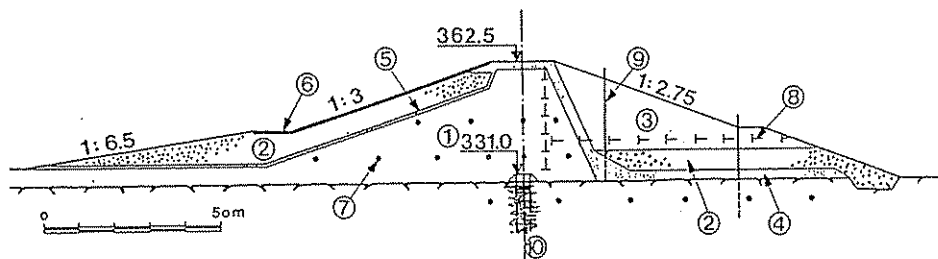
Typical section of a zoned earthfill dam. Example Agus IV dam, Philippines 1984.
